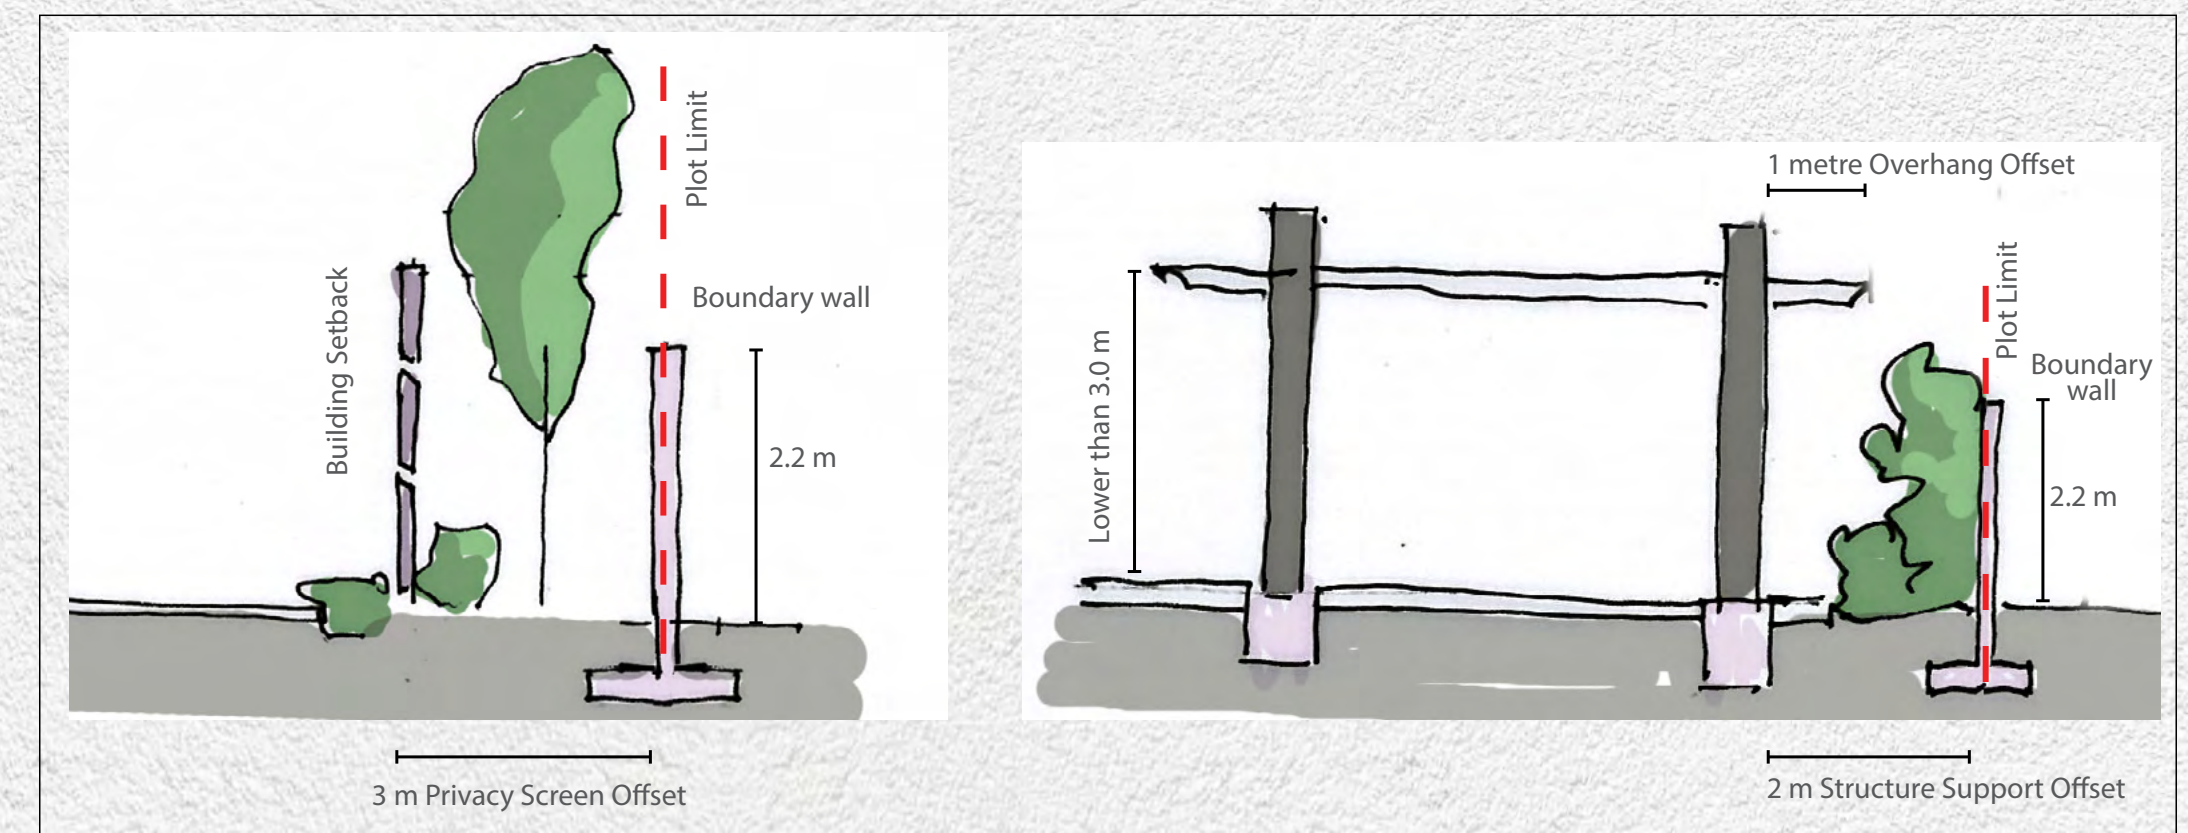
Indicative section at Party wall and Indicative section for outdoor light structure
